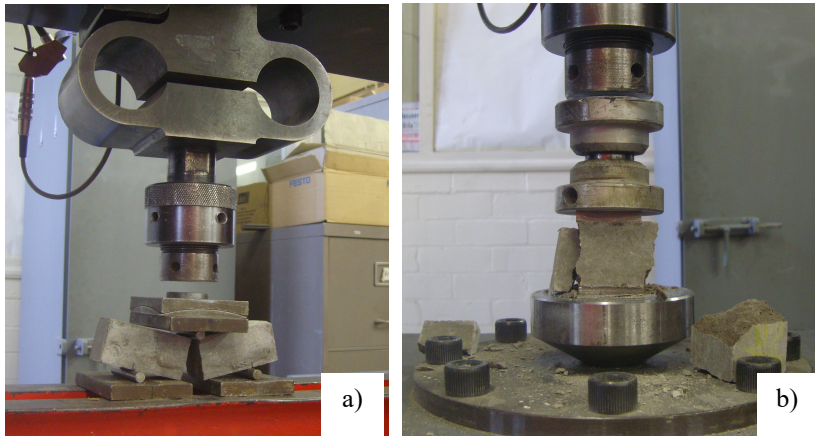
Tests on mortar samples: a) three-point bending test; b) compressive test
